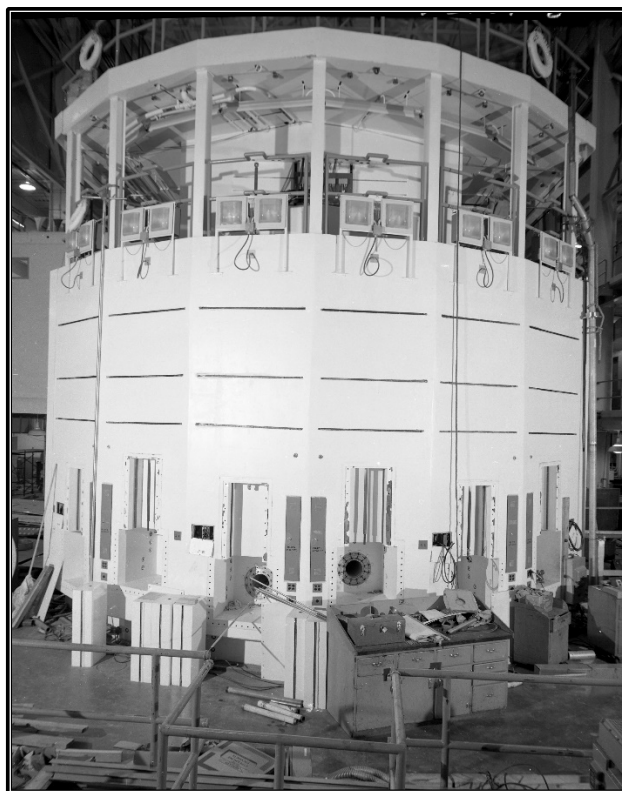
Archival photograph showing the ORR structure in the high bay of Building 3042 nearing completion, facing west, circa 1957 (ORNL Photo 42186).
